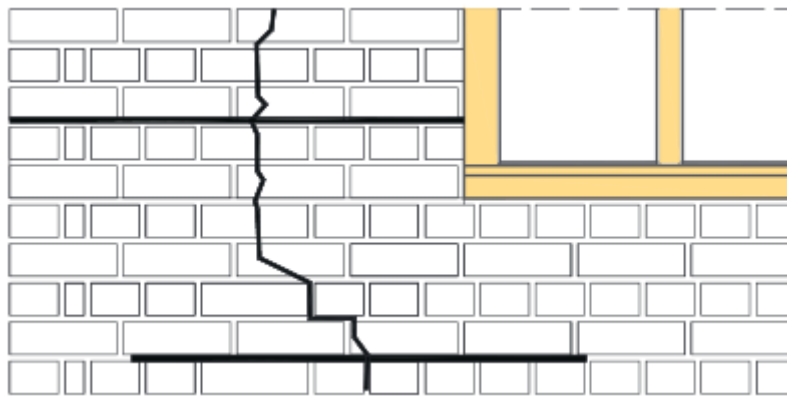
Repairing the walls with vertical and diagonal cracks.
